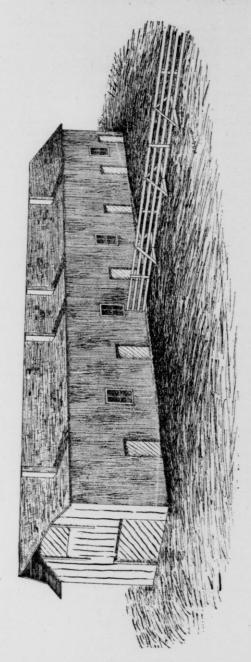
Fig. IV.-Perspective View of Sheep Shed Built on Second Plan.
